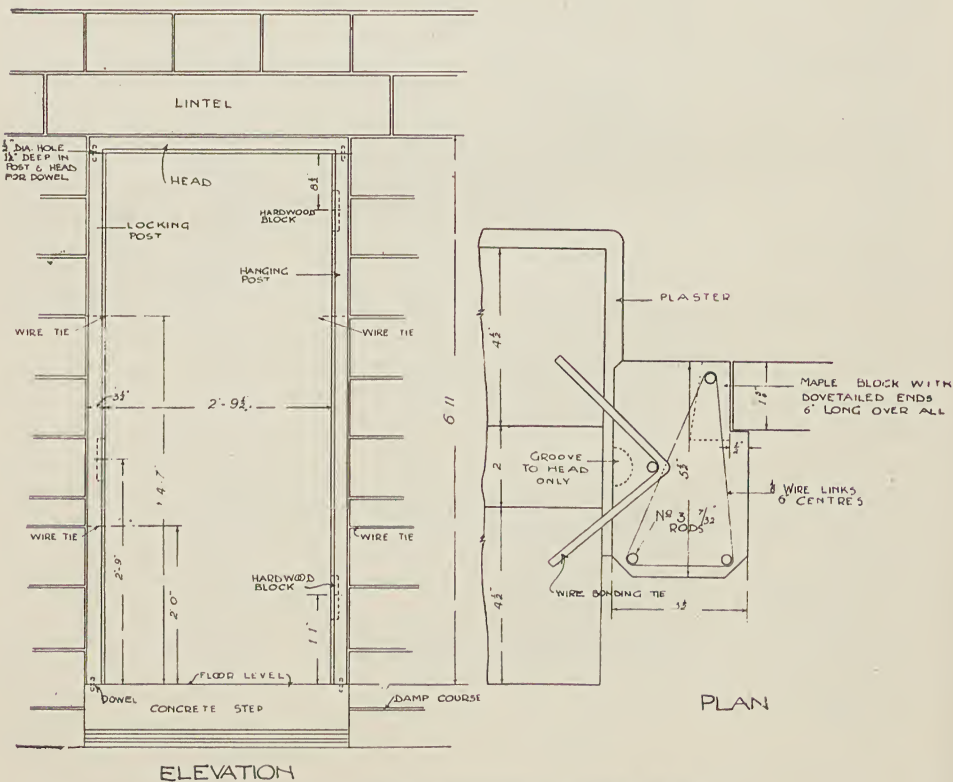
DETAIL OF CONCRETE DOOR FRAME.
